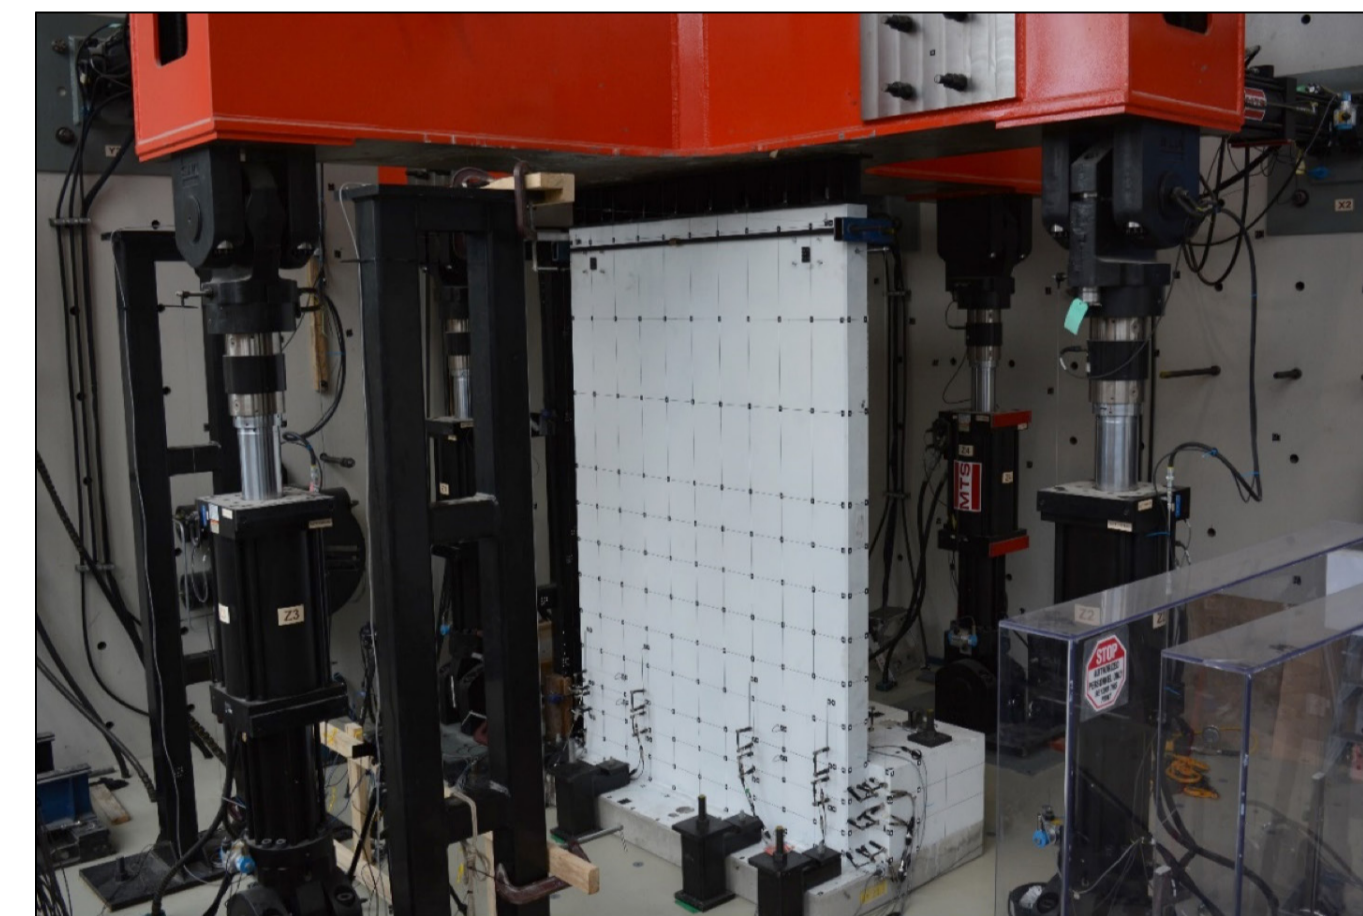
Bi-directional tests on precast panel connections in the MAST facility
